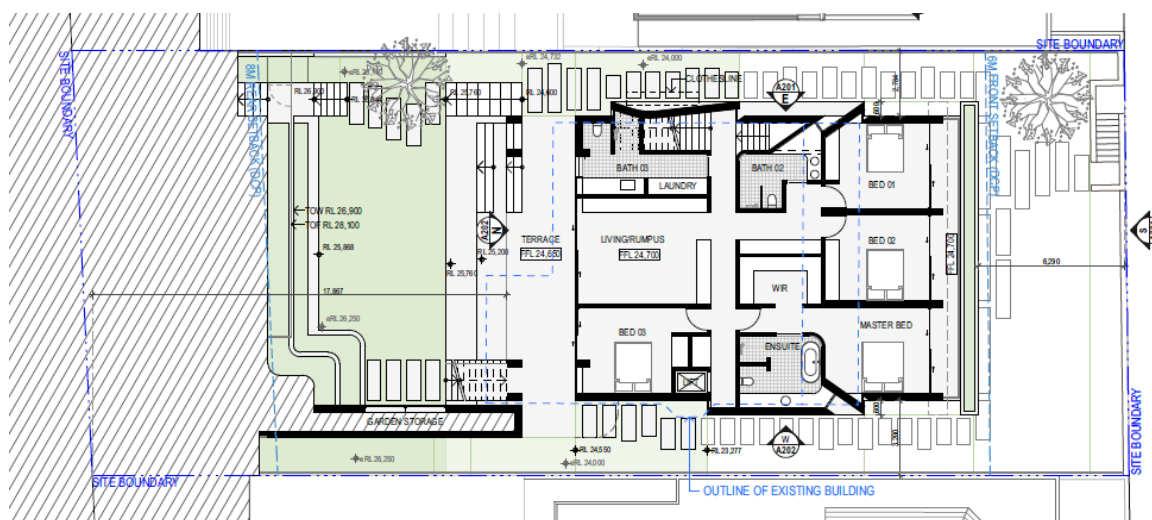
Extract of Ground Floor Plan (Source: Archer Office)
